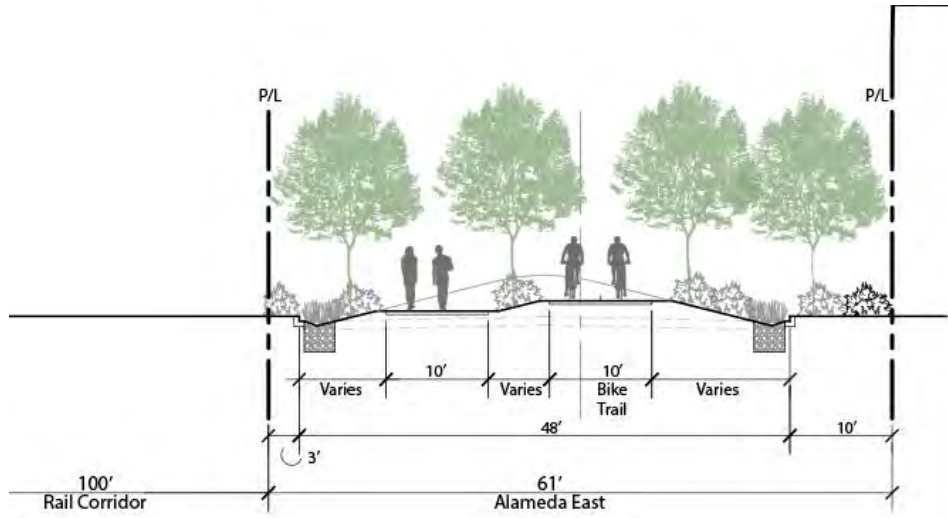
Alameda East Greenway Typical Cross-Section (Preferred Alternative).
